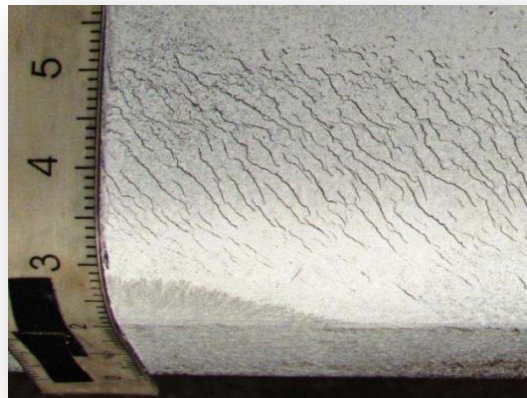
Magnetic particle testing on a rail with Head Check [1]
